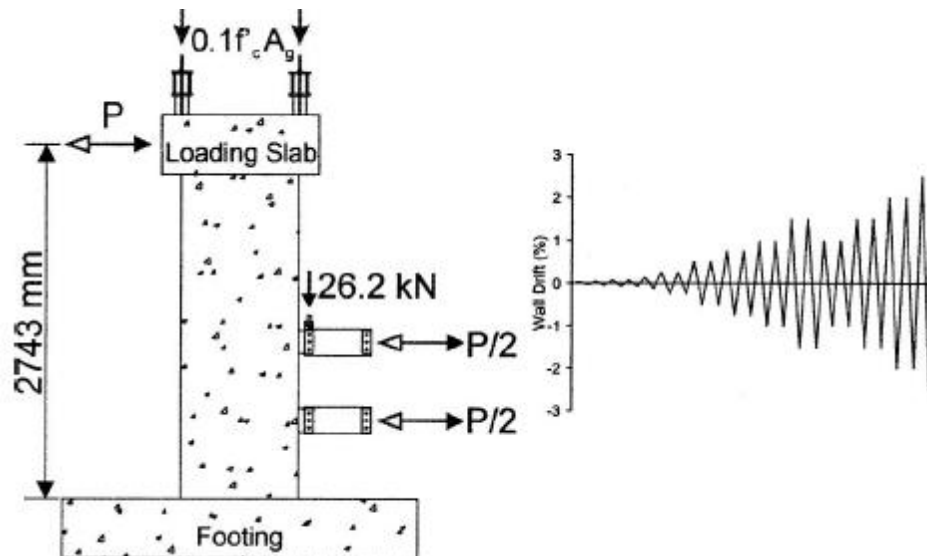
Prototype structure of the tested girder-wall connections (Shahrooz et al. 2004)
